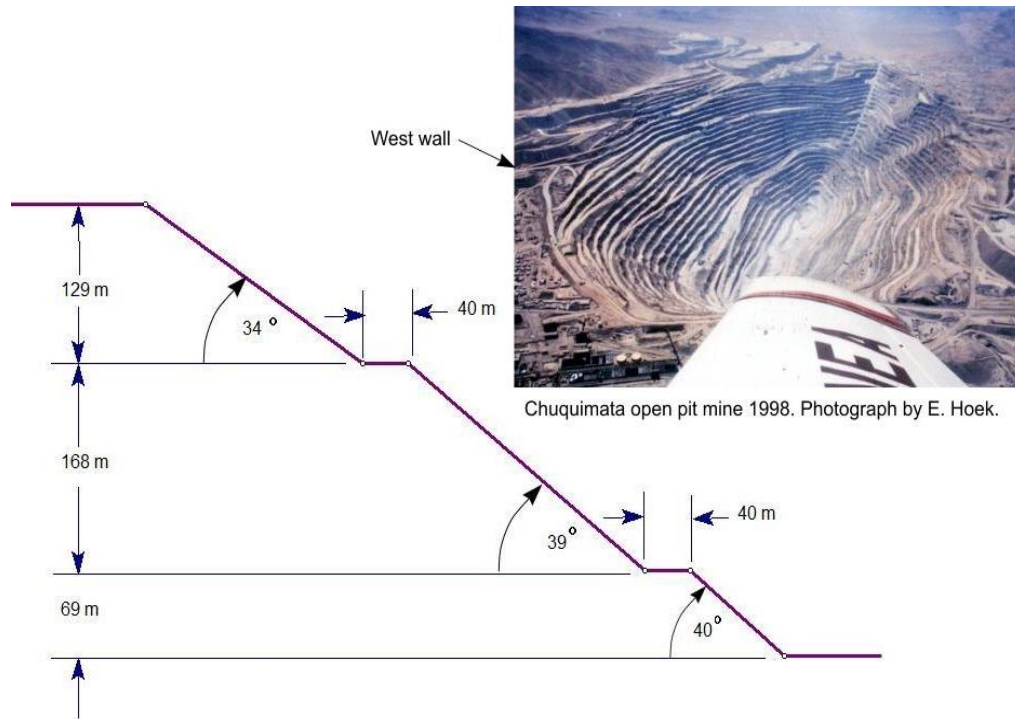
Simplified cross section of Chuquicamata mine west wall.
